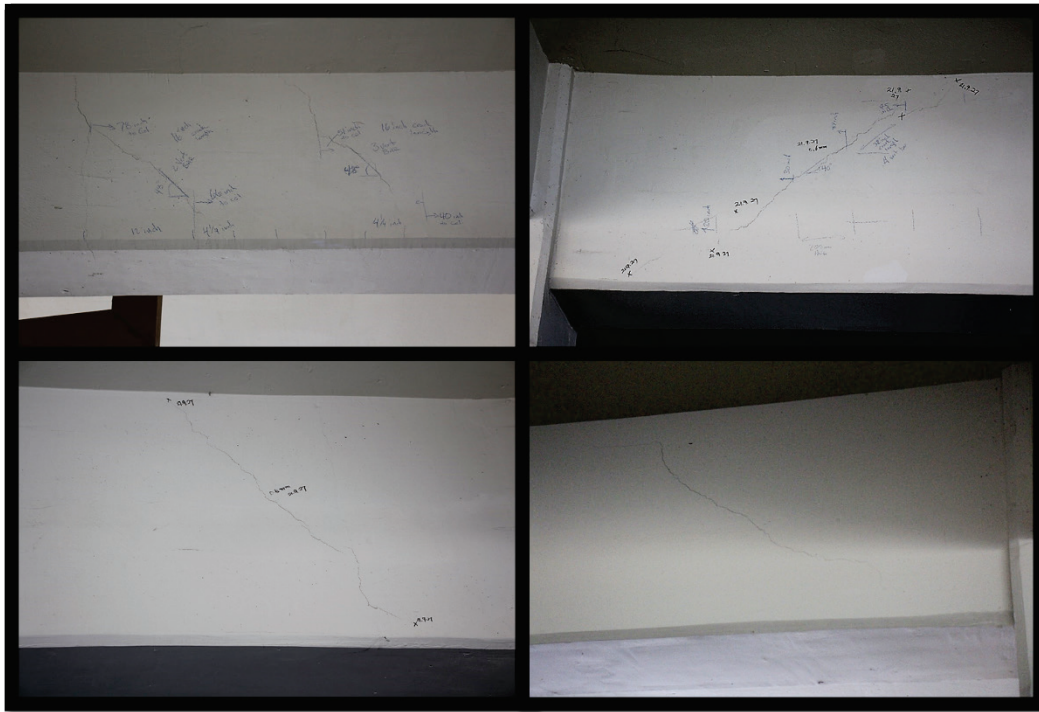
Diagonal cracks in girders in Parking Garage 1.
